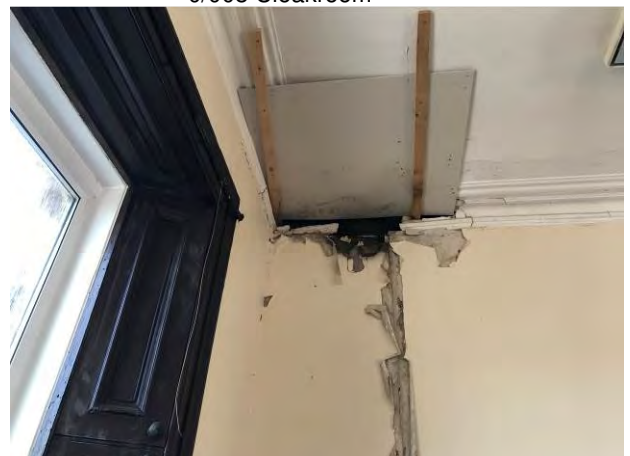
Water damage to ceiling within room 0/007 Office
